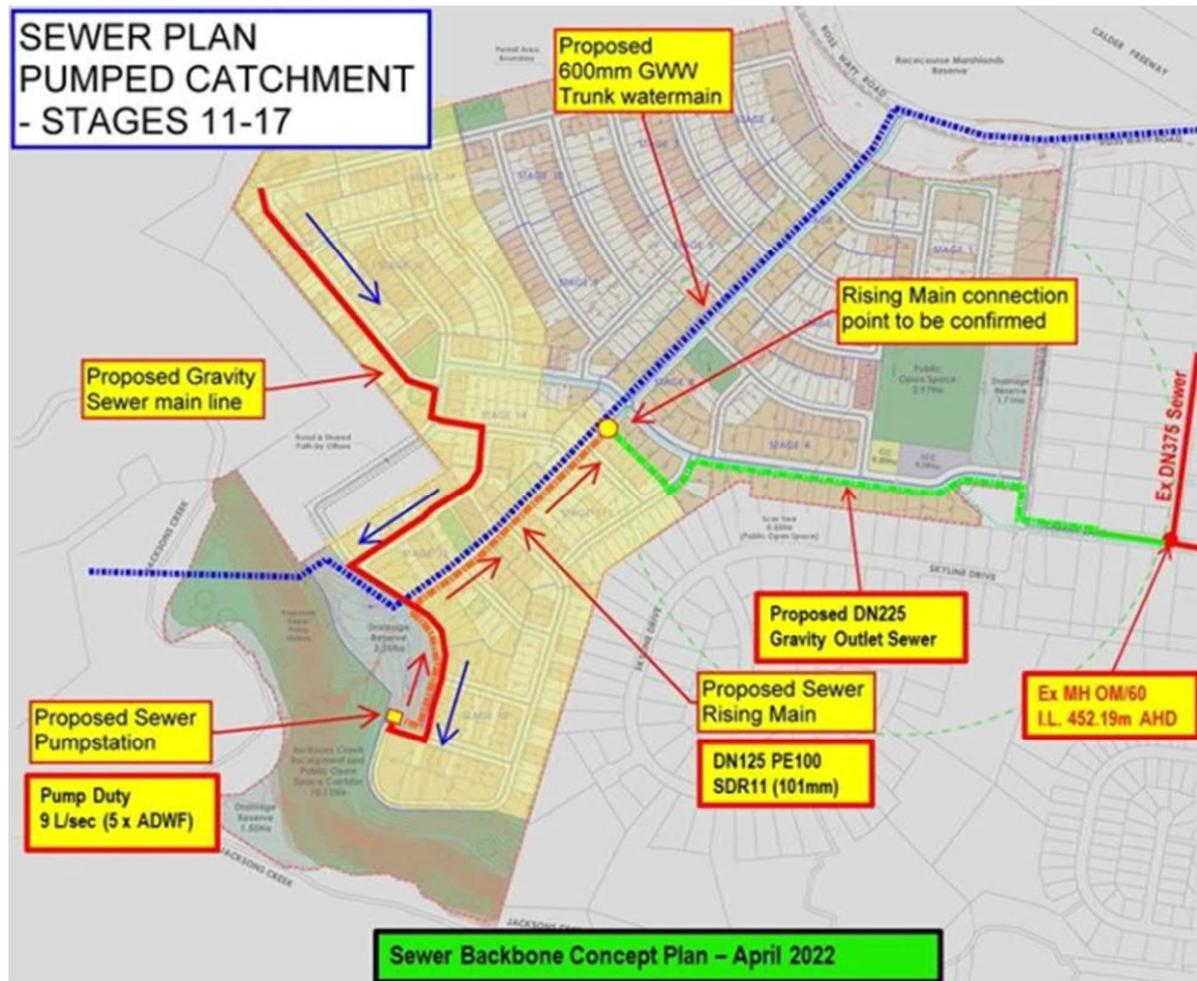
Sewer Backbone Concept Plan – April 2022 (Supplied by GWW)
